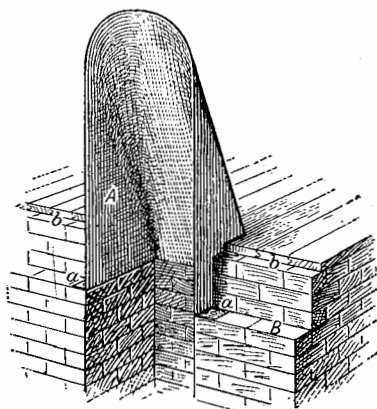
Sectional View of Airtight Sheet Metal Connection to Brick Flue
